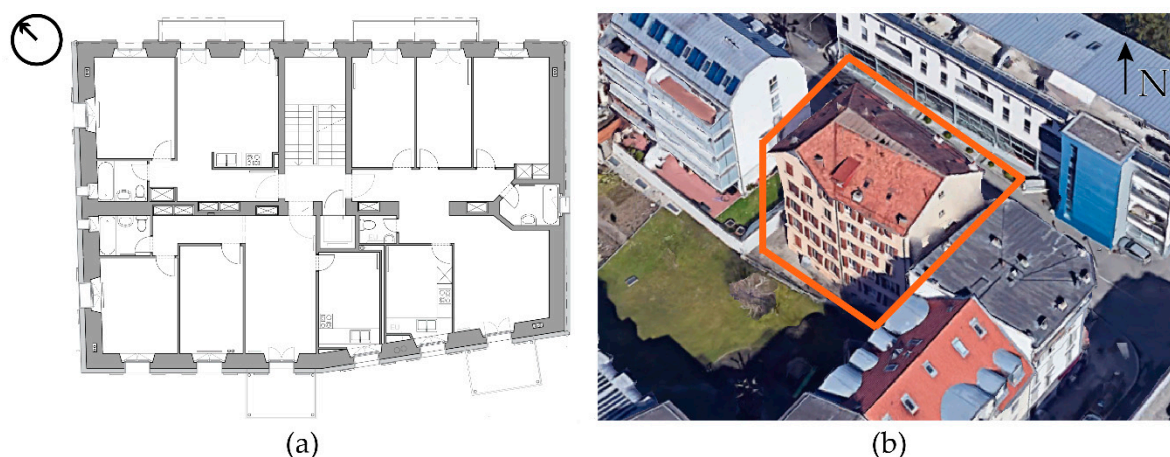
(a) Plan and orientation of the Swiss case study building; and (b) overview of the building and its surroundings.
